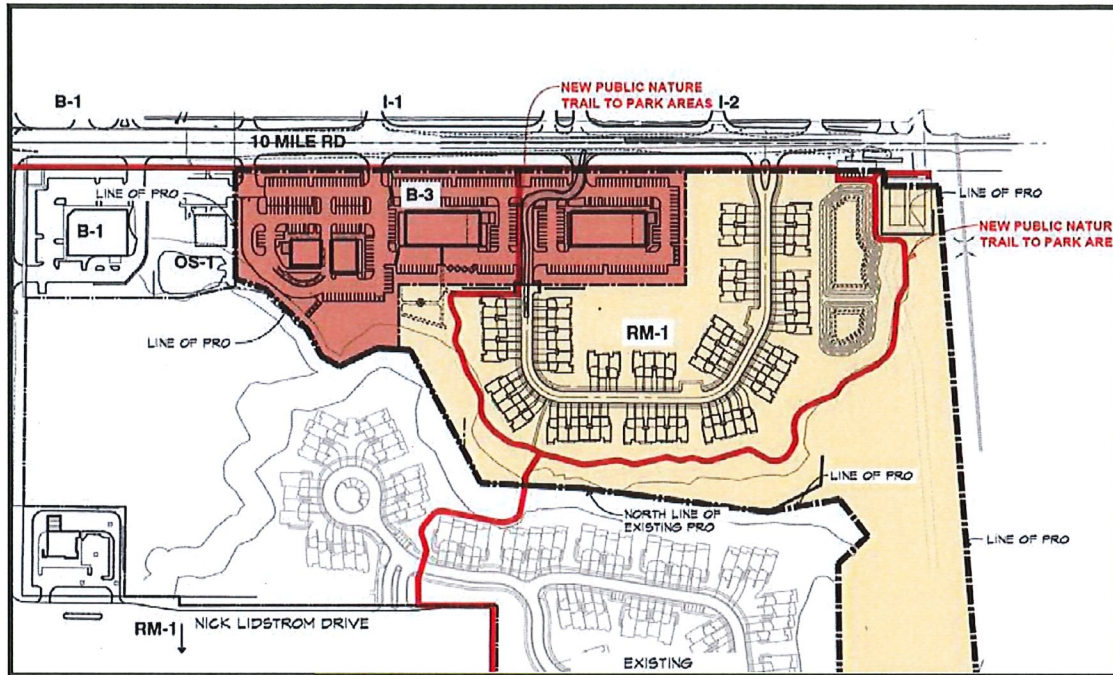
Novi / 10 PRO Concept Plan
